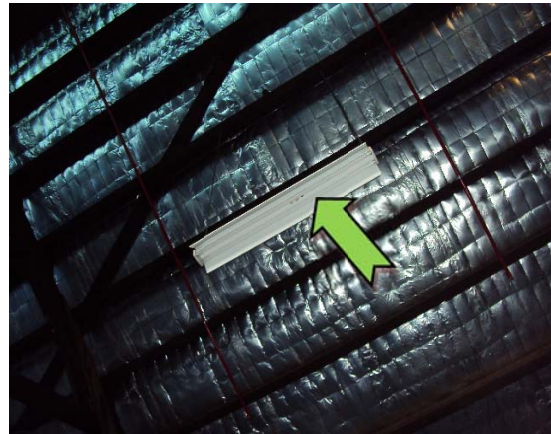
Interior, level 1, ceiling throughout, double tube fluorescent light fittings – suspected PCB-containing capacitors
